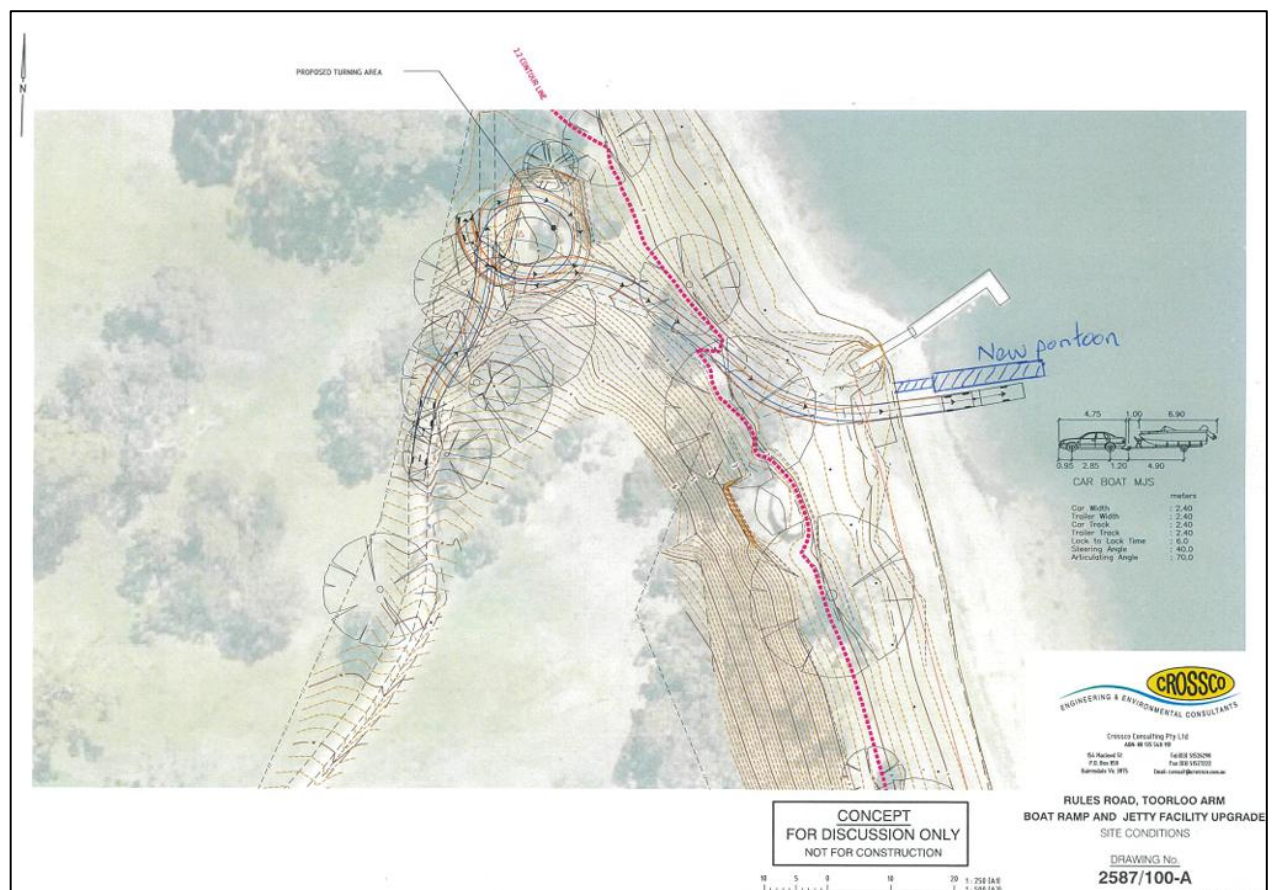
Proposed boat ramp & pontoon jetty engineering drawings and sketch (Drawing No. 2587/100-A) (Source: Gippsland Ports).
